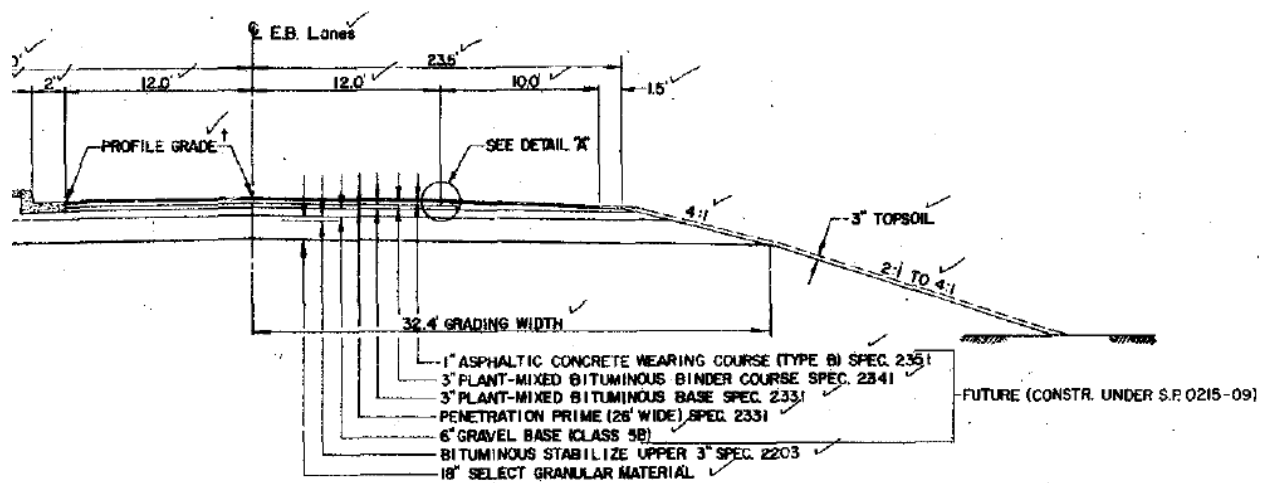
TH 10 mainline typical section (1964 construction plan)
